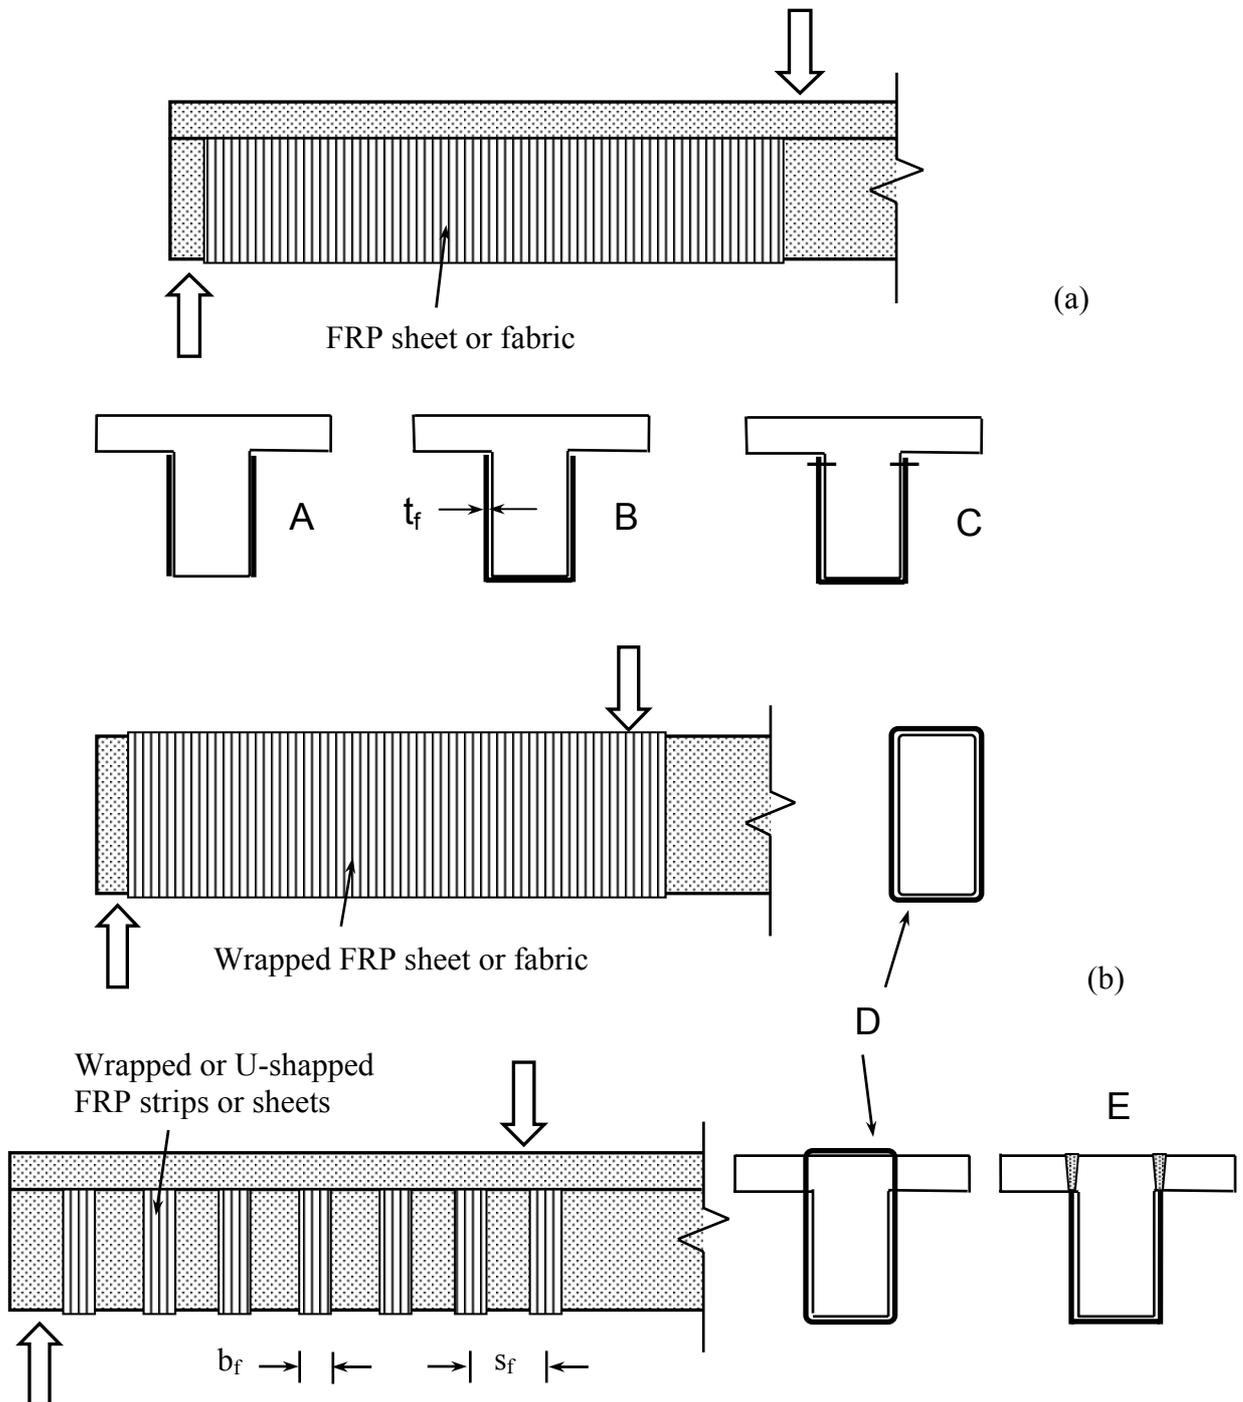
Schematic illustration of reinforced concrete element strengthened in shear with FRP: (a) FRP sheets or fabrics bonded to the web; (b) wrapped or U-shaped FRP (the concept shown in D is applicable to both beams and columns).
